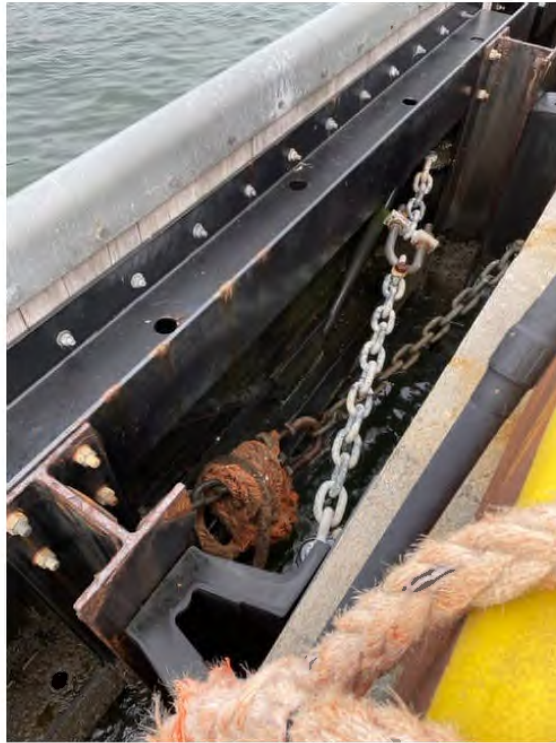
General Conditions of Steel Frame, Piles and Bracing Chains
